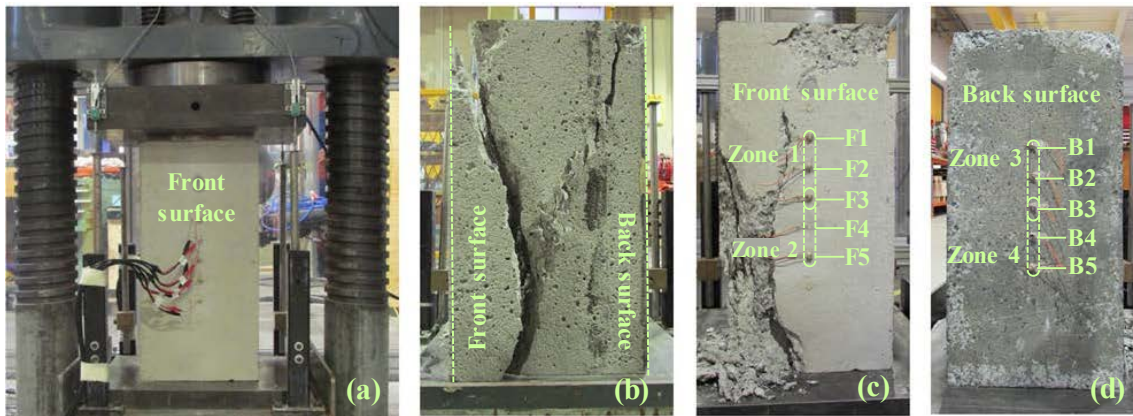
(a) Arrangement of the test specimen in the hydraulic press, (b) side view of the fractured specimen, (c-d) front and back views of the fractured specimen.
